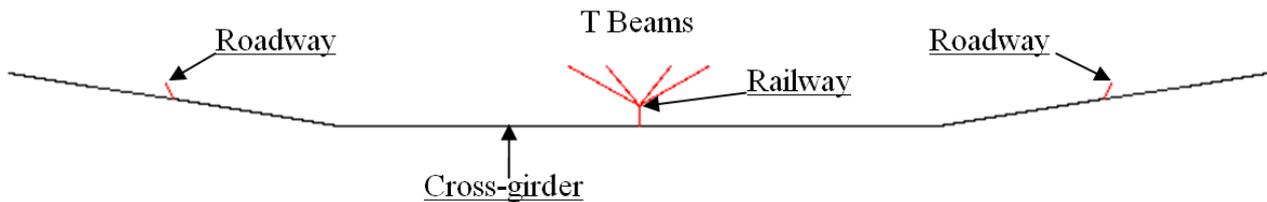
Front view of the multi-beam model. Kinematic rigid links, shown here in red, are used to connect the railway girder to cross girder and T beams.
